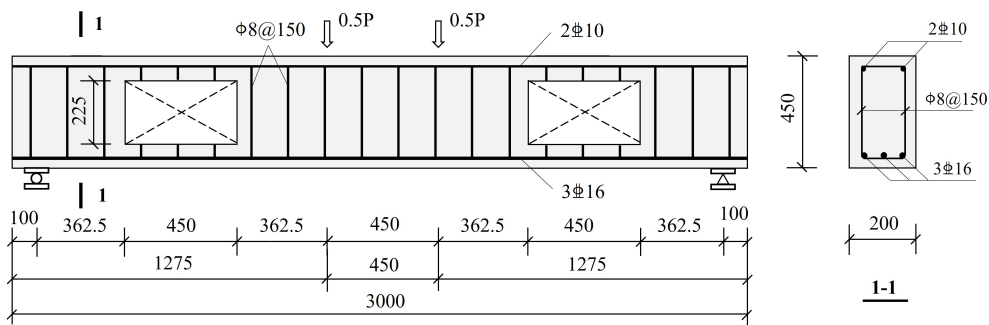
Load layout and geometry of the RC beam with web openings (Unit:mm)
